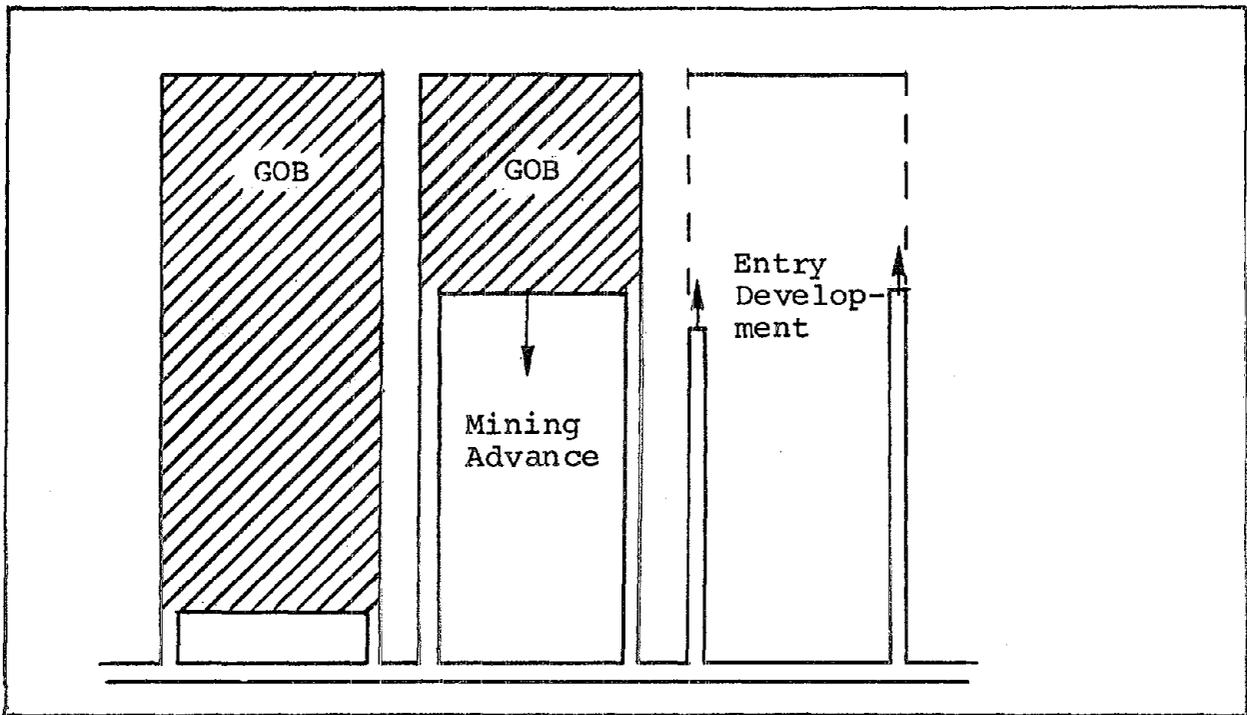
Single Entry Retreat Longwall with Barrier Pillars
